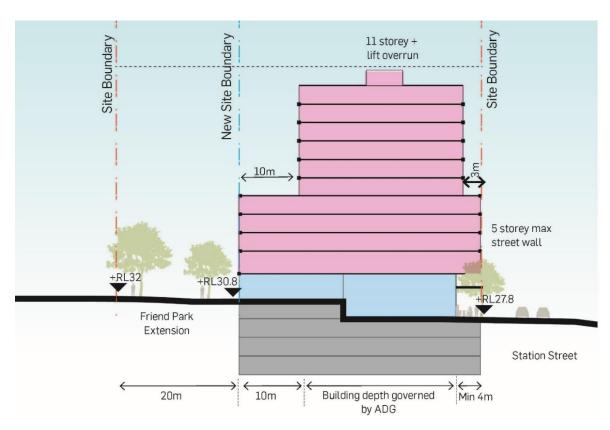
Figure F: Section B-B through Corner of Pritchard Street and Station Street Precinct – typical east—west tower section
